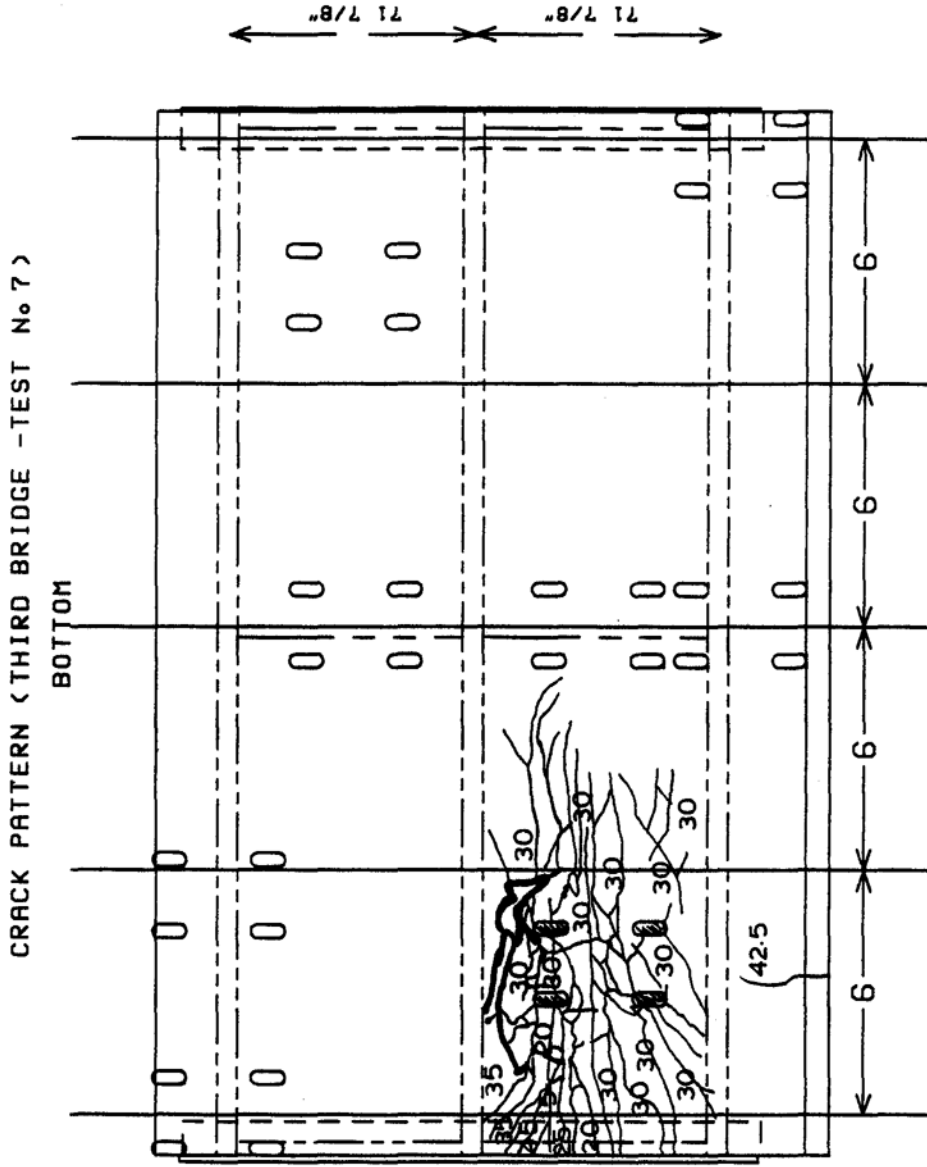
Bottom Cracking Pattern (Third Bridge - Test No. 7)
